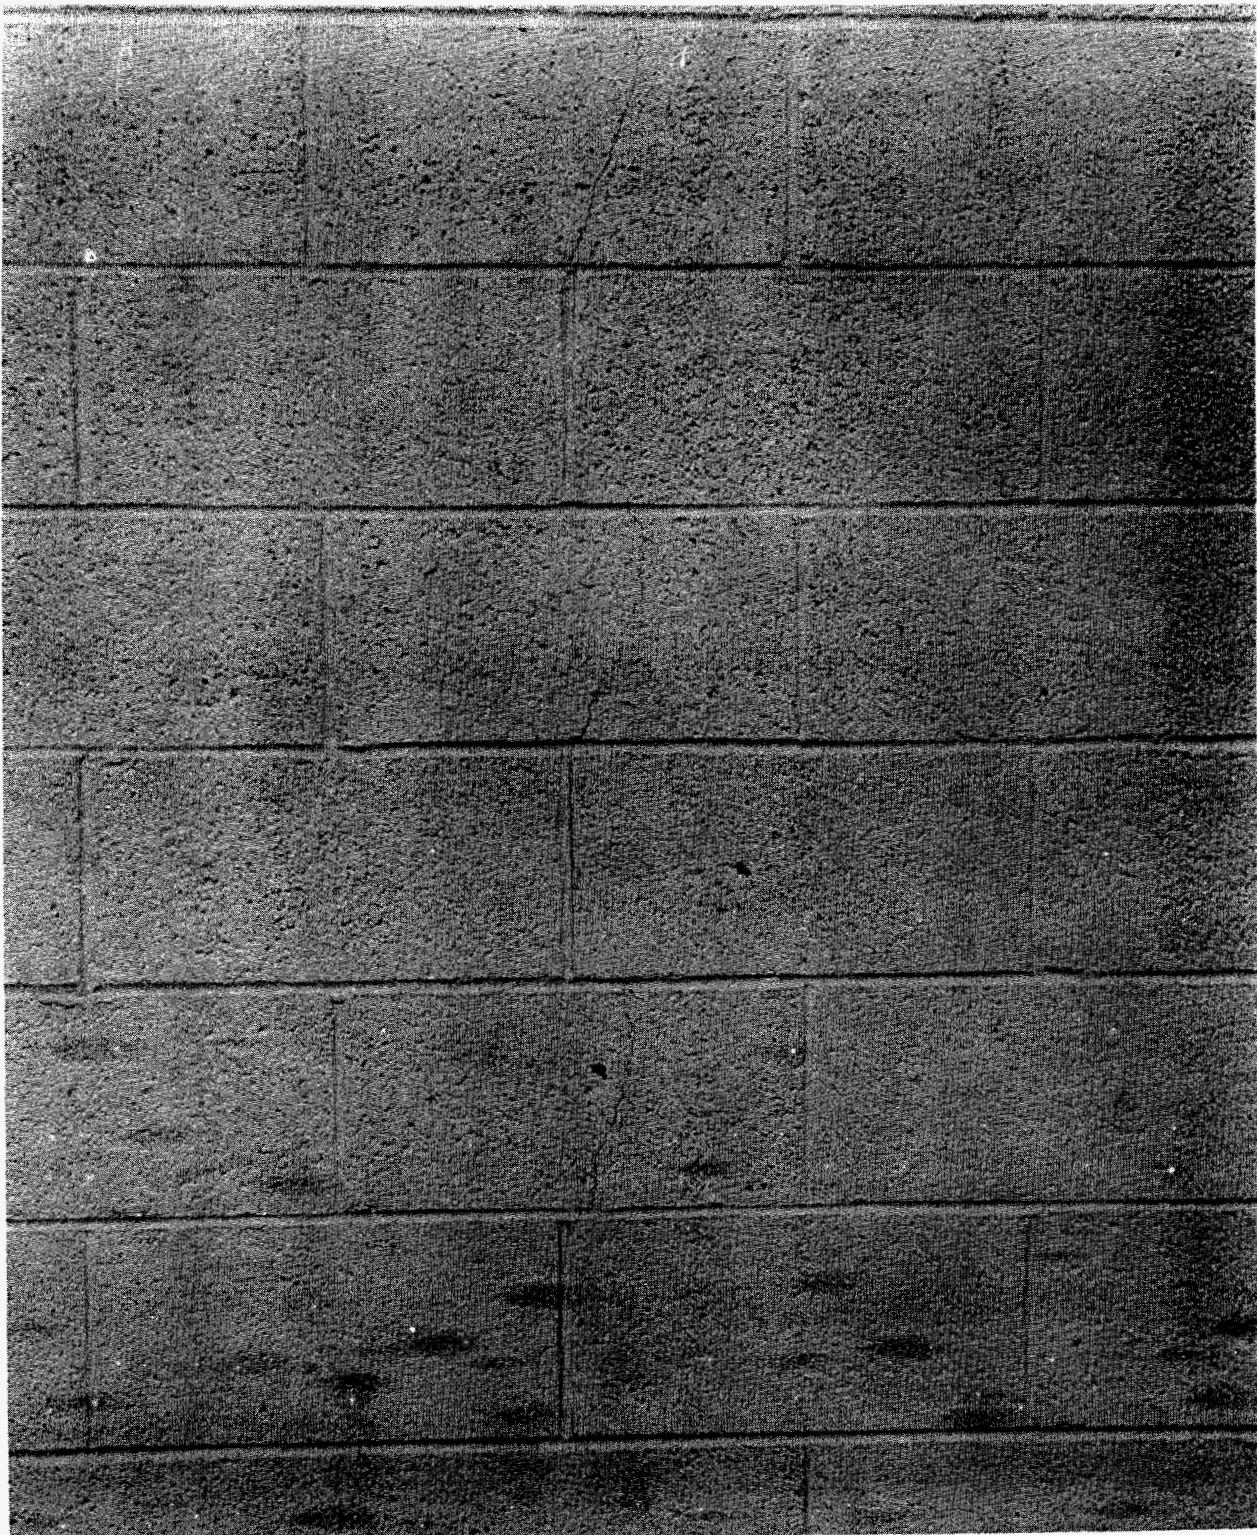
Building 700, south wall, 0.21 cm/sec.
